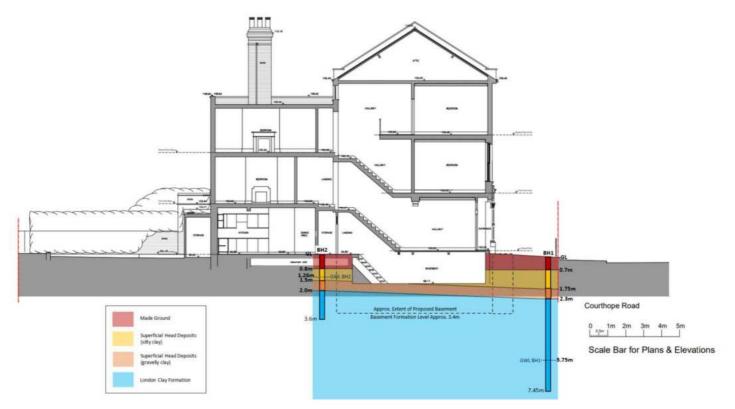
Ground Model (existing section from STAC Architecture Limited 'General Arrangement Elevations & Section A-A & B-B as Existing).
